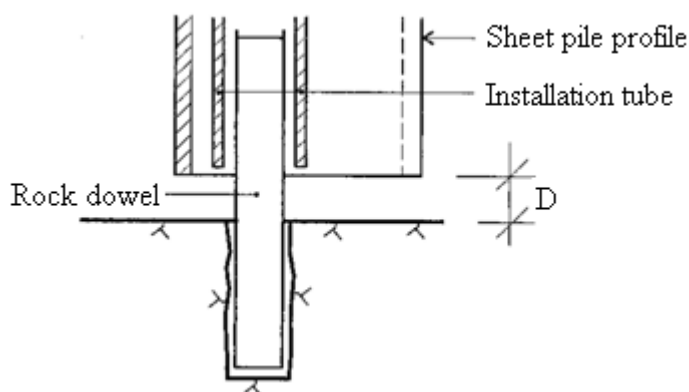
Gap between the toe of the sheet pile and the rock surface. (Ryner, Fredriksson, Stille, 1996).
